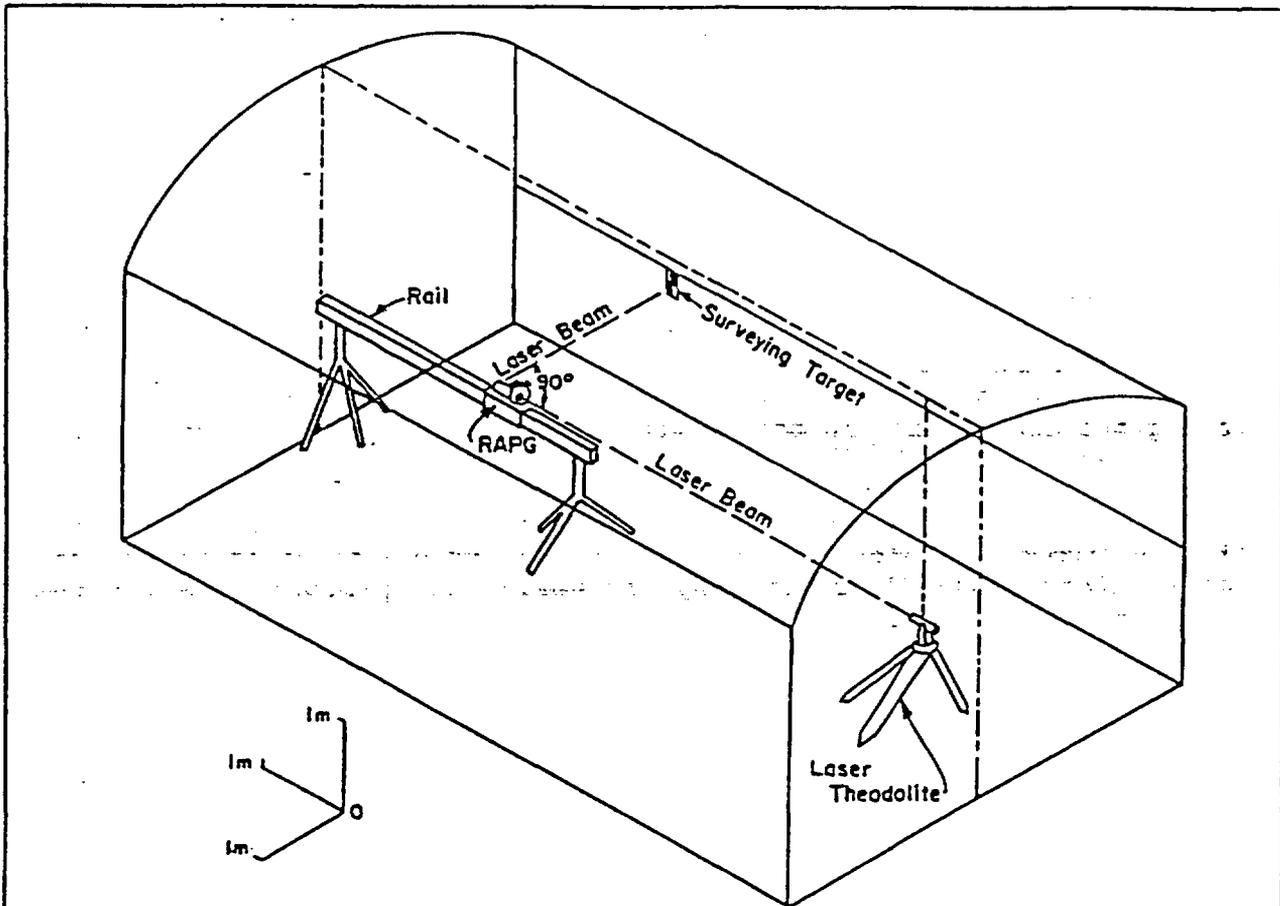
Configuration of drift prototype test showing the right-angle prism goniometer (RAPG) and camera rail.
